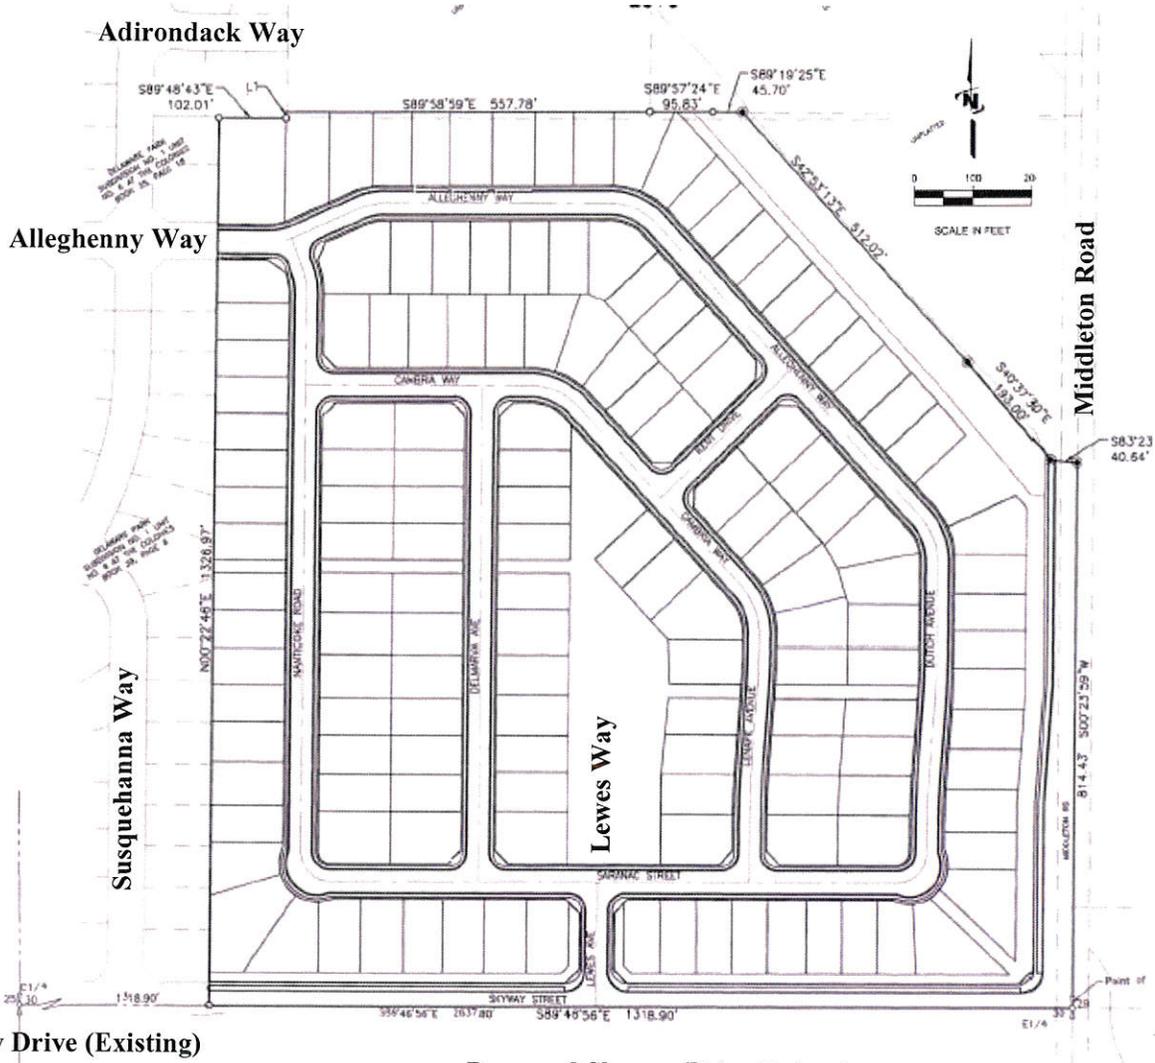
shows the preliminary site plan and access locations. Wagon Wheel Subdivision is a proposed residential development containing 146 single-family dwelling units with an expected 2026 build-out year. The development is proposing one full access driveway on Skyway Drive for site access. The development is planning to construct one half of Skyway Drive (2 lanes) along the site frontage connecting to Middleton Road. The subdivision will connect to an existing stub road at Allegheny Way of the Delaware Park Subdivision.
